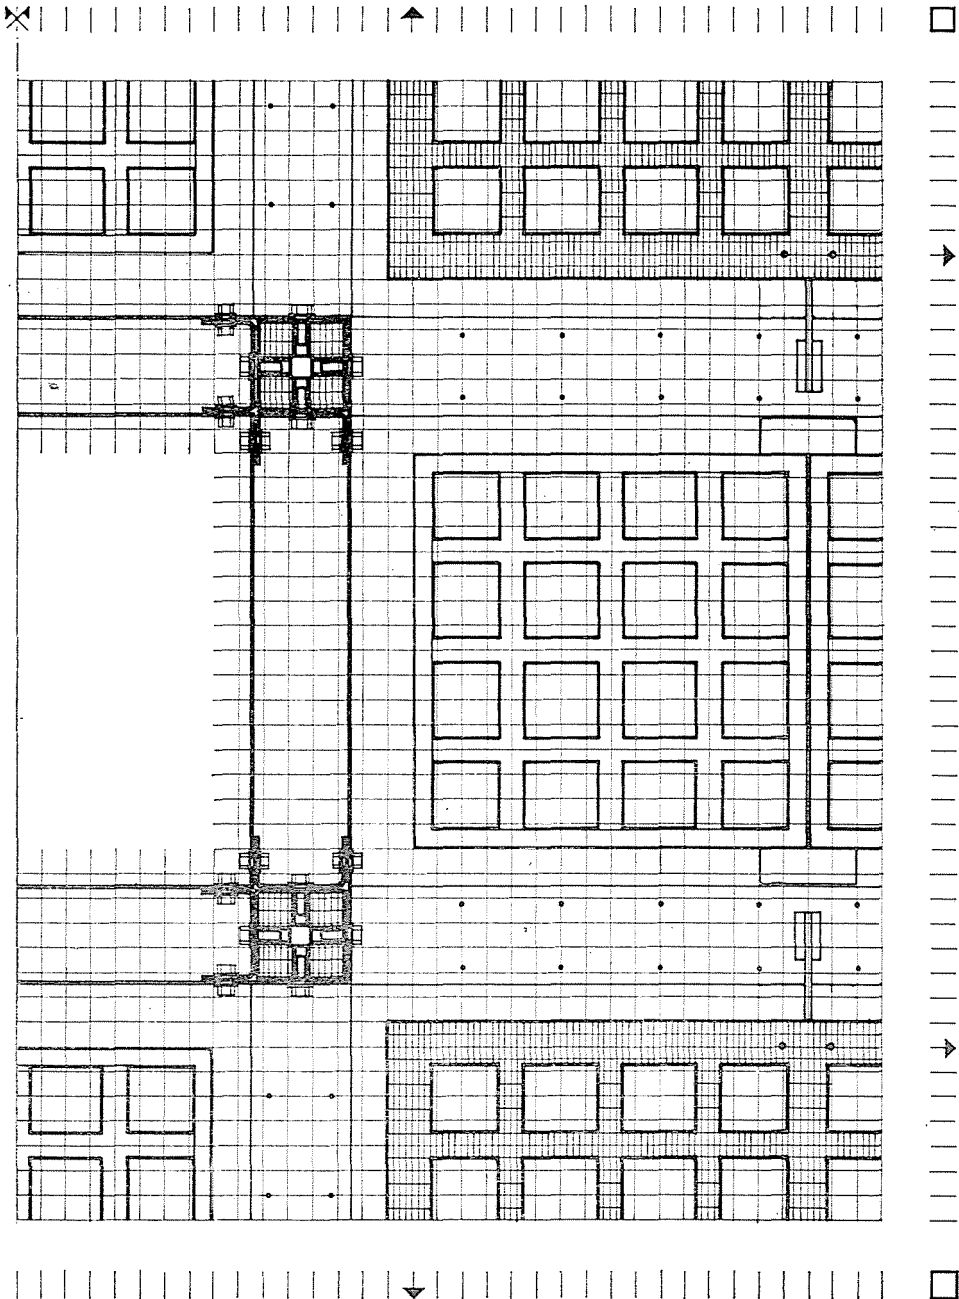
The lift-cell building method: The repetitive structural unit; microgrid details. Horizontal section through pillar skeleton-frame above beam box-frame level. The location of the cellular floor-field and the floors above the beam-zones in the system of the micro grid, on plan. The heterogeneous junctions between the upper steel cradle and r.c. column elements is shown on the left hand side; the position of the cellular floor-fields in the system of the parameter and micro grids is shown on the right hand side. The perimeter ribs of the cellular floor field fit on the 72M × 72M primary grid, the normal ribs on the 6M × 6M secondary grid whereas the ribs of the r.c. tissue on the 1,5M × 1,5M = 4mc × 4mc grid. The floor-field already lifted into in-situ position is temporarily fixed by the "legs"; finally: the position of the cellular, periodic surface-of-floor elements above the zone of beam-frames is shown in the micro-grid on plan, in the situation preceding the pouring in of concrete
